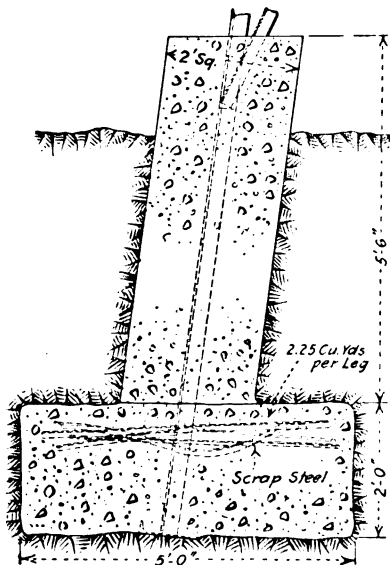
GREAT WESTERN POWER CO. TOWER FOOTINGS FOR STANDARD TOWERS
